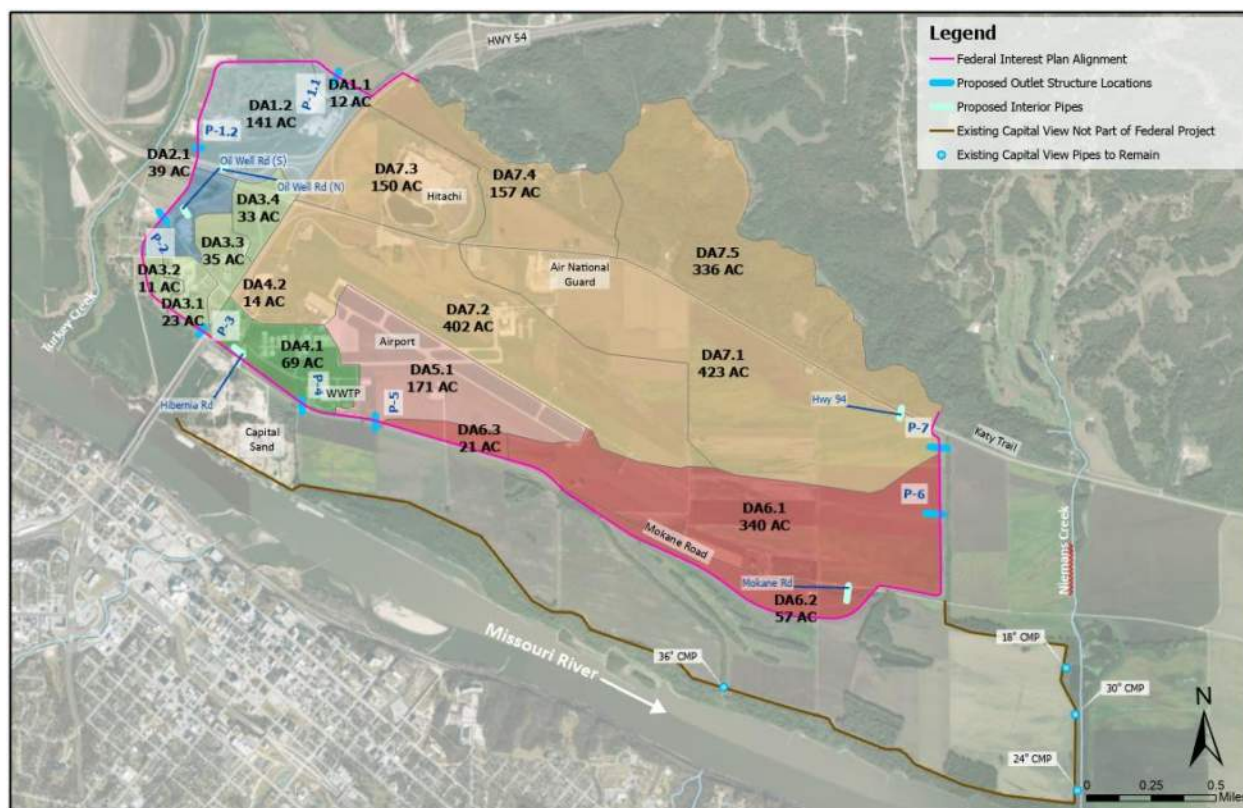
Federal Interest Plan Drainage Areas and Levee System Outlet Structures
